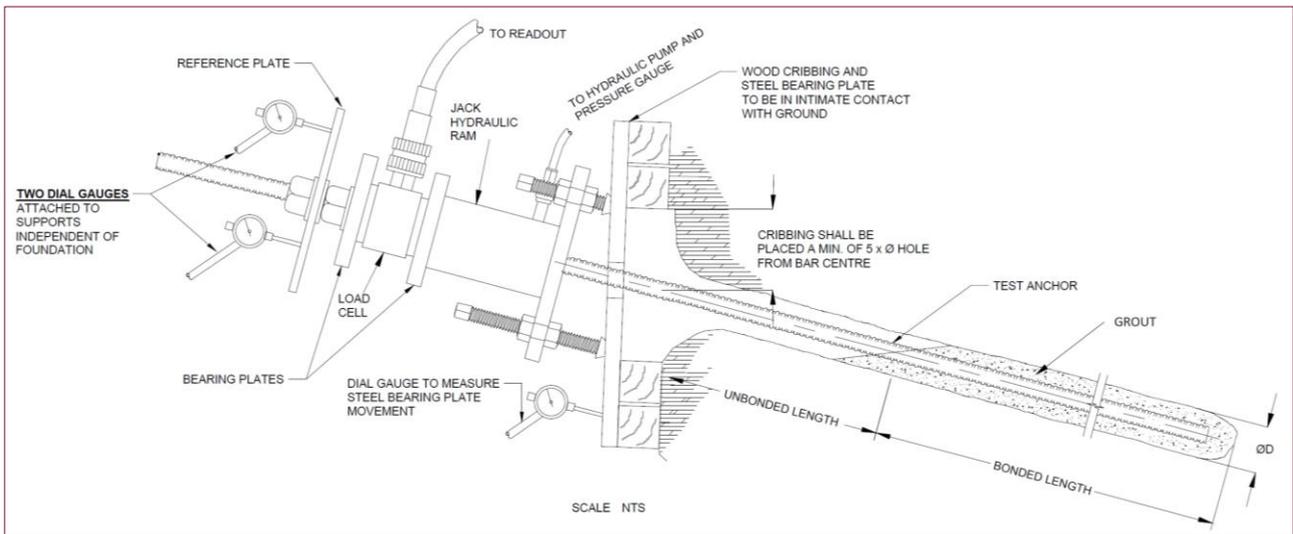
NCTIR standard detail for sacrificial anchor installation and testing.
